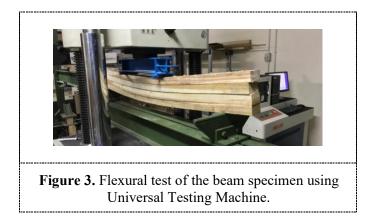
show the testing process for one specimen of laminated timber beams. The test method is the four-point loading test with a distance of 500 mm (1/3 beam span). Furthermore, Figure 4 show the variety of beam failures that occur in the test object, namely simple tension, this is in accordance with one of the flexural test object failure models based on ASTM D143 [2] so that the expected failure occurs in accordance with the test results.
